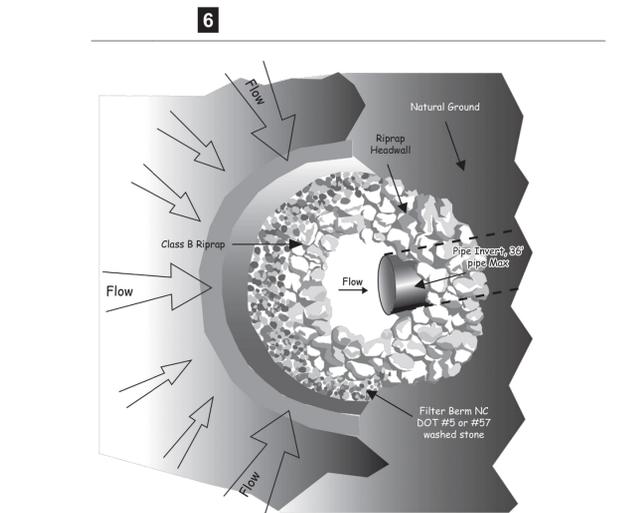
Rock pipe inlet protection plan view and cross-section view
